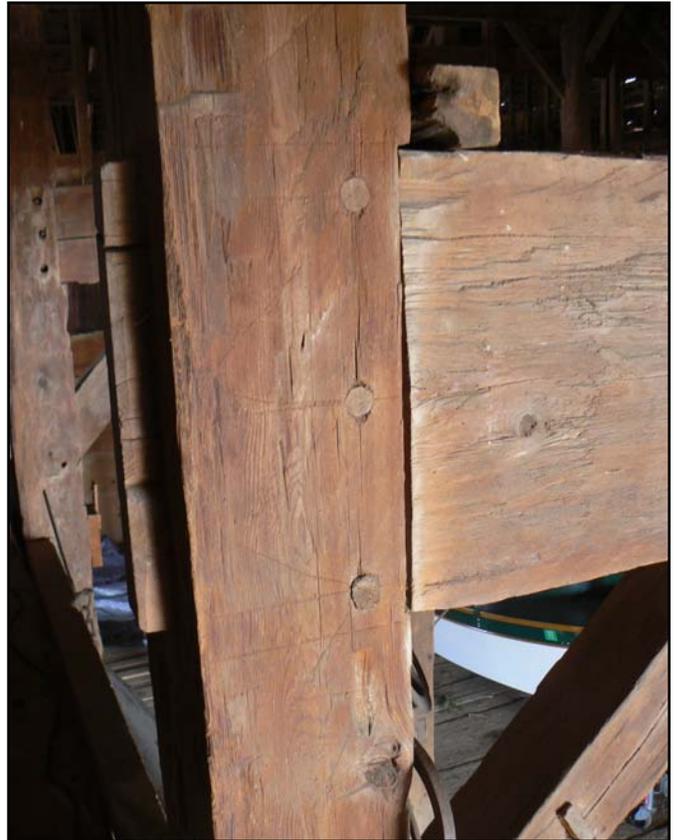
Detail of one of the anchor beam ends, showing scribe marks and small tenon projection (Ned Pratt).
